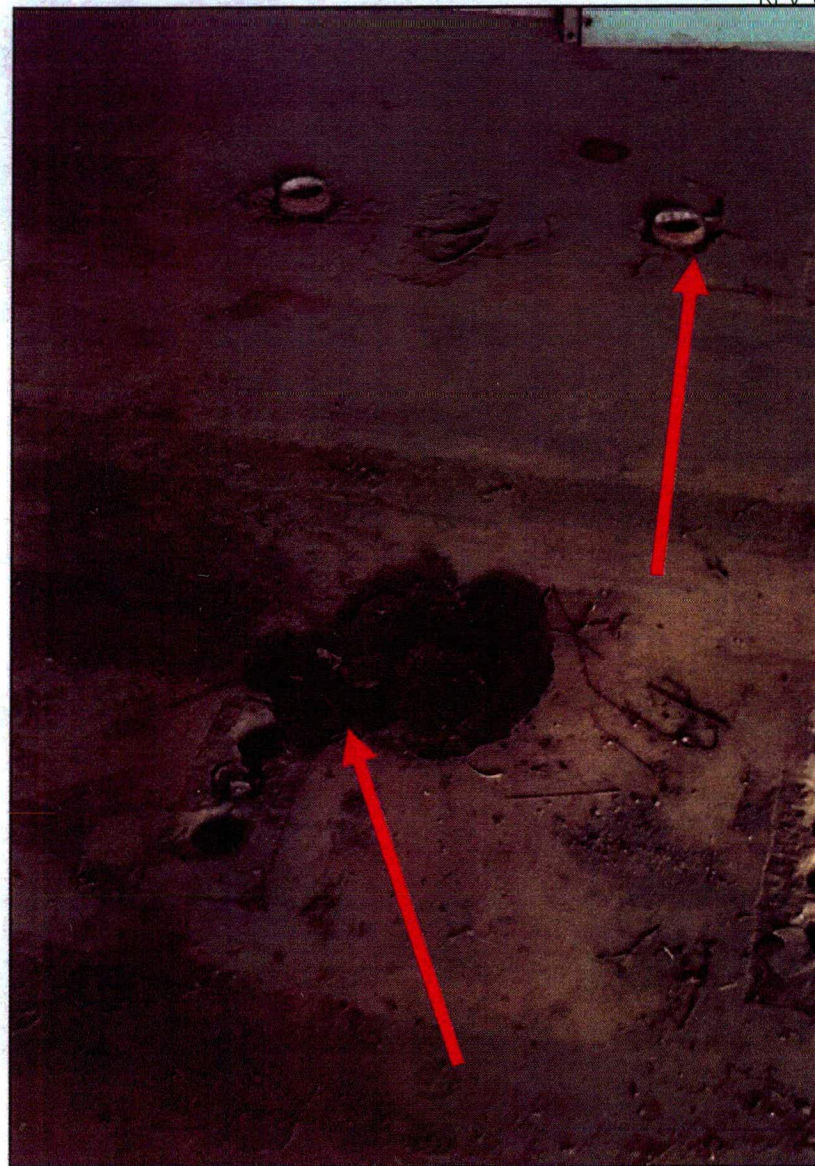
View of black colored sealant used in conduit floor penetrations (facing northwest).
